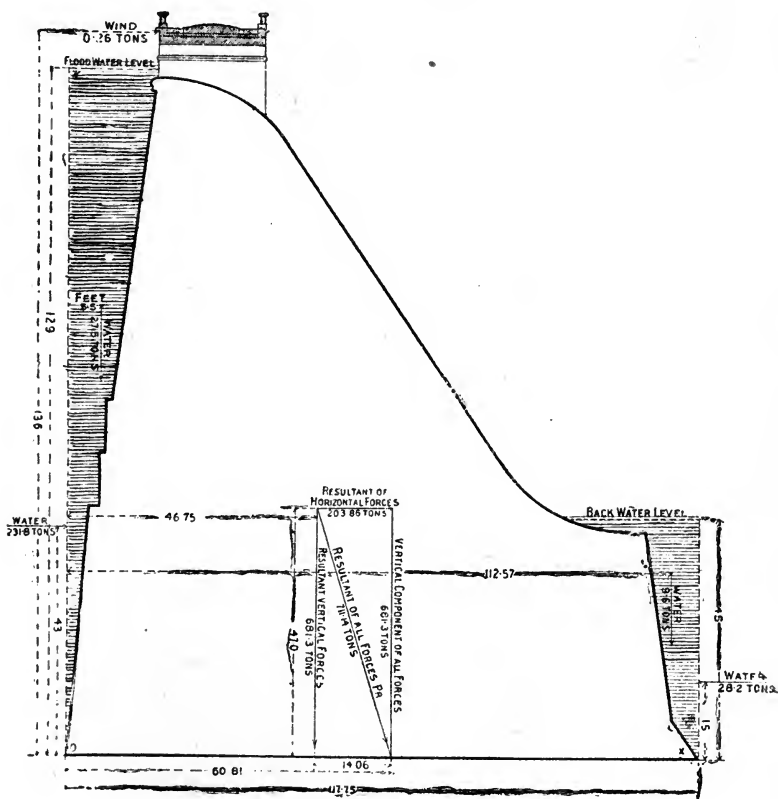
CROSS SECTION OF VYRNWY DAM, WALES.
